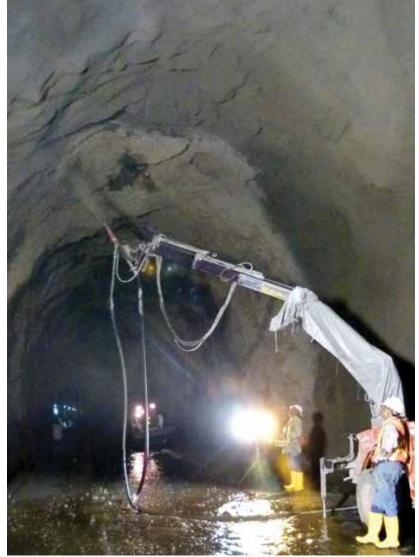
QUIKRETE Shotcrete MS used for a tunnel relining
